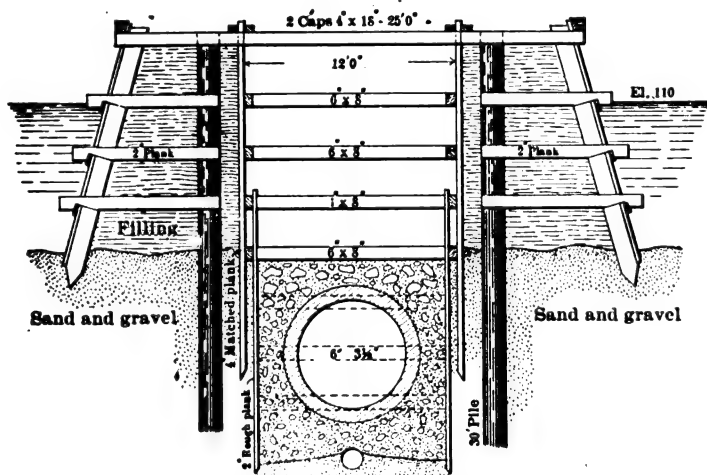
SEWER COFFER-DAM. BOSTON SEWERAGE SYSTEM.
